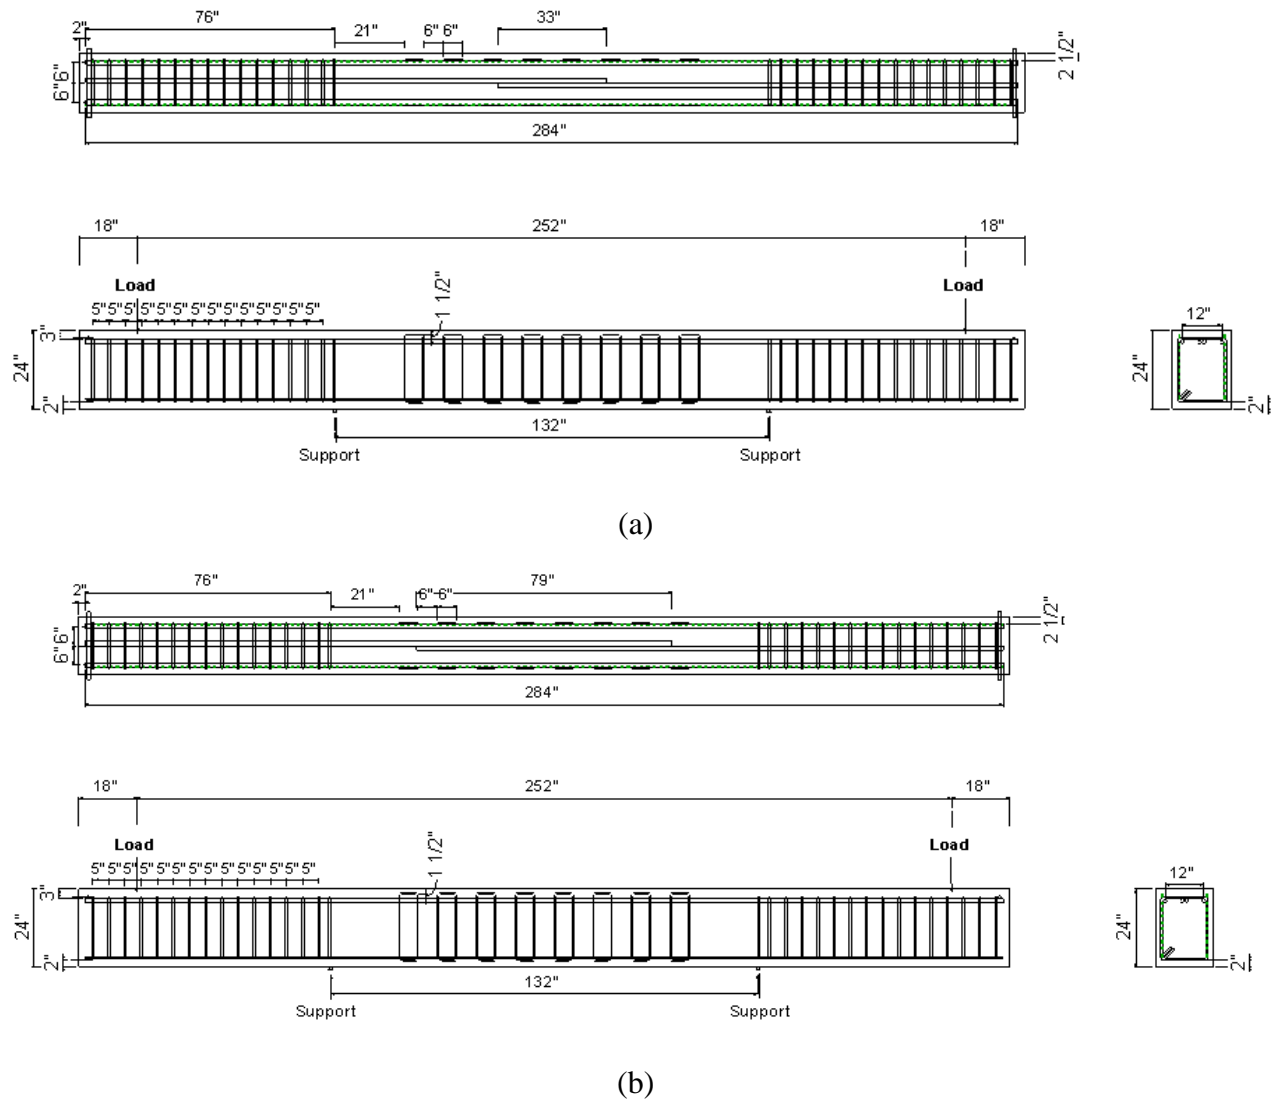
Reinforcing steel drawing. (a) Beam A1 – specimen with a 33-in. splice length. (b) Beam A2 – specimen with a 79-in. splice length
